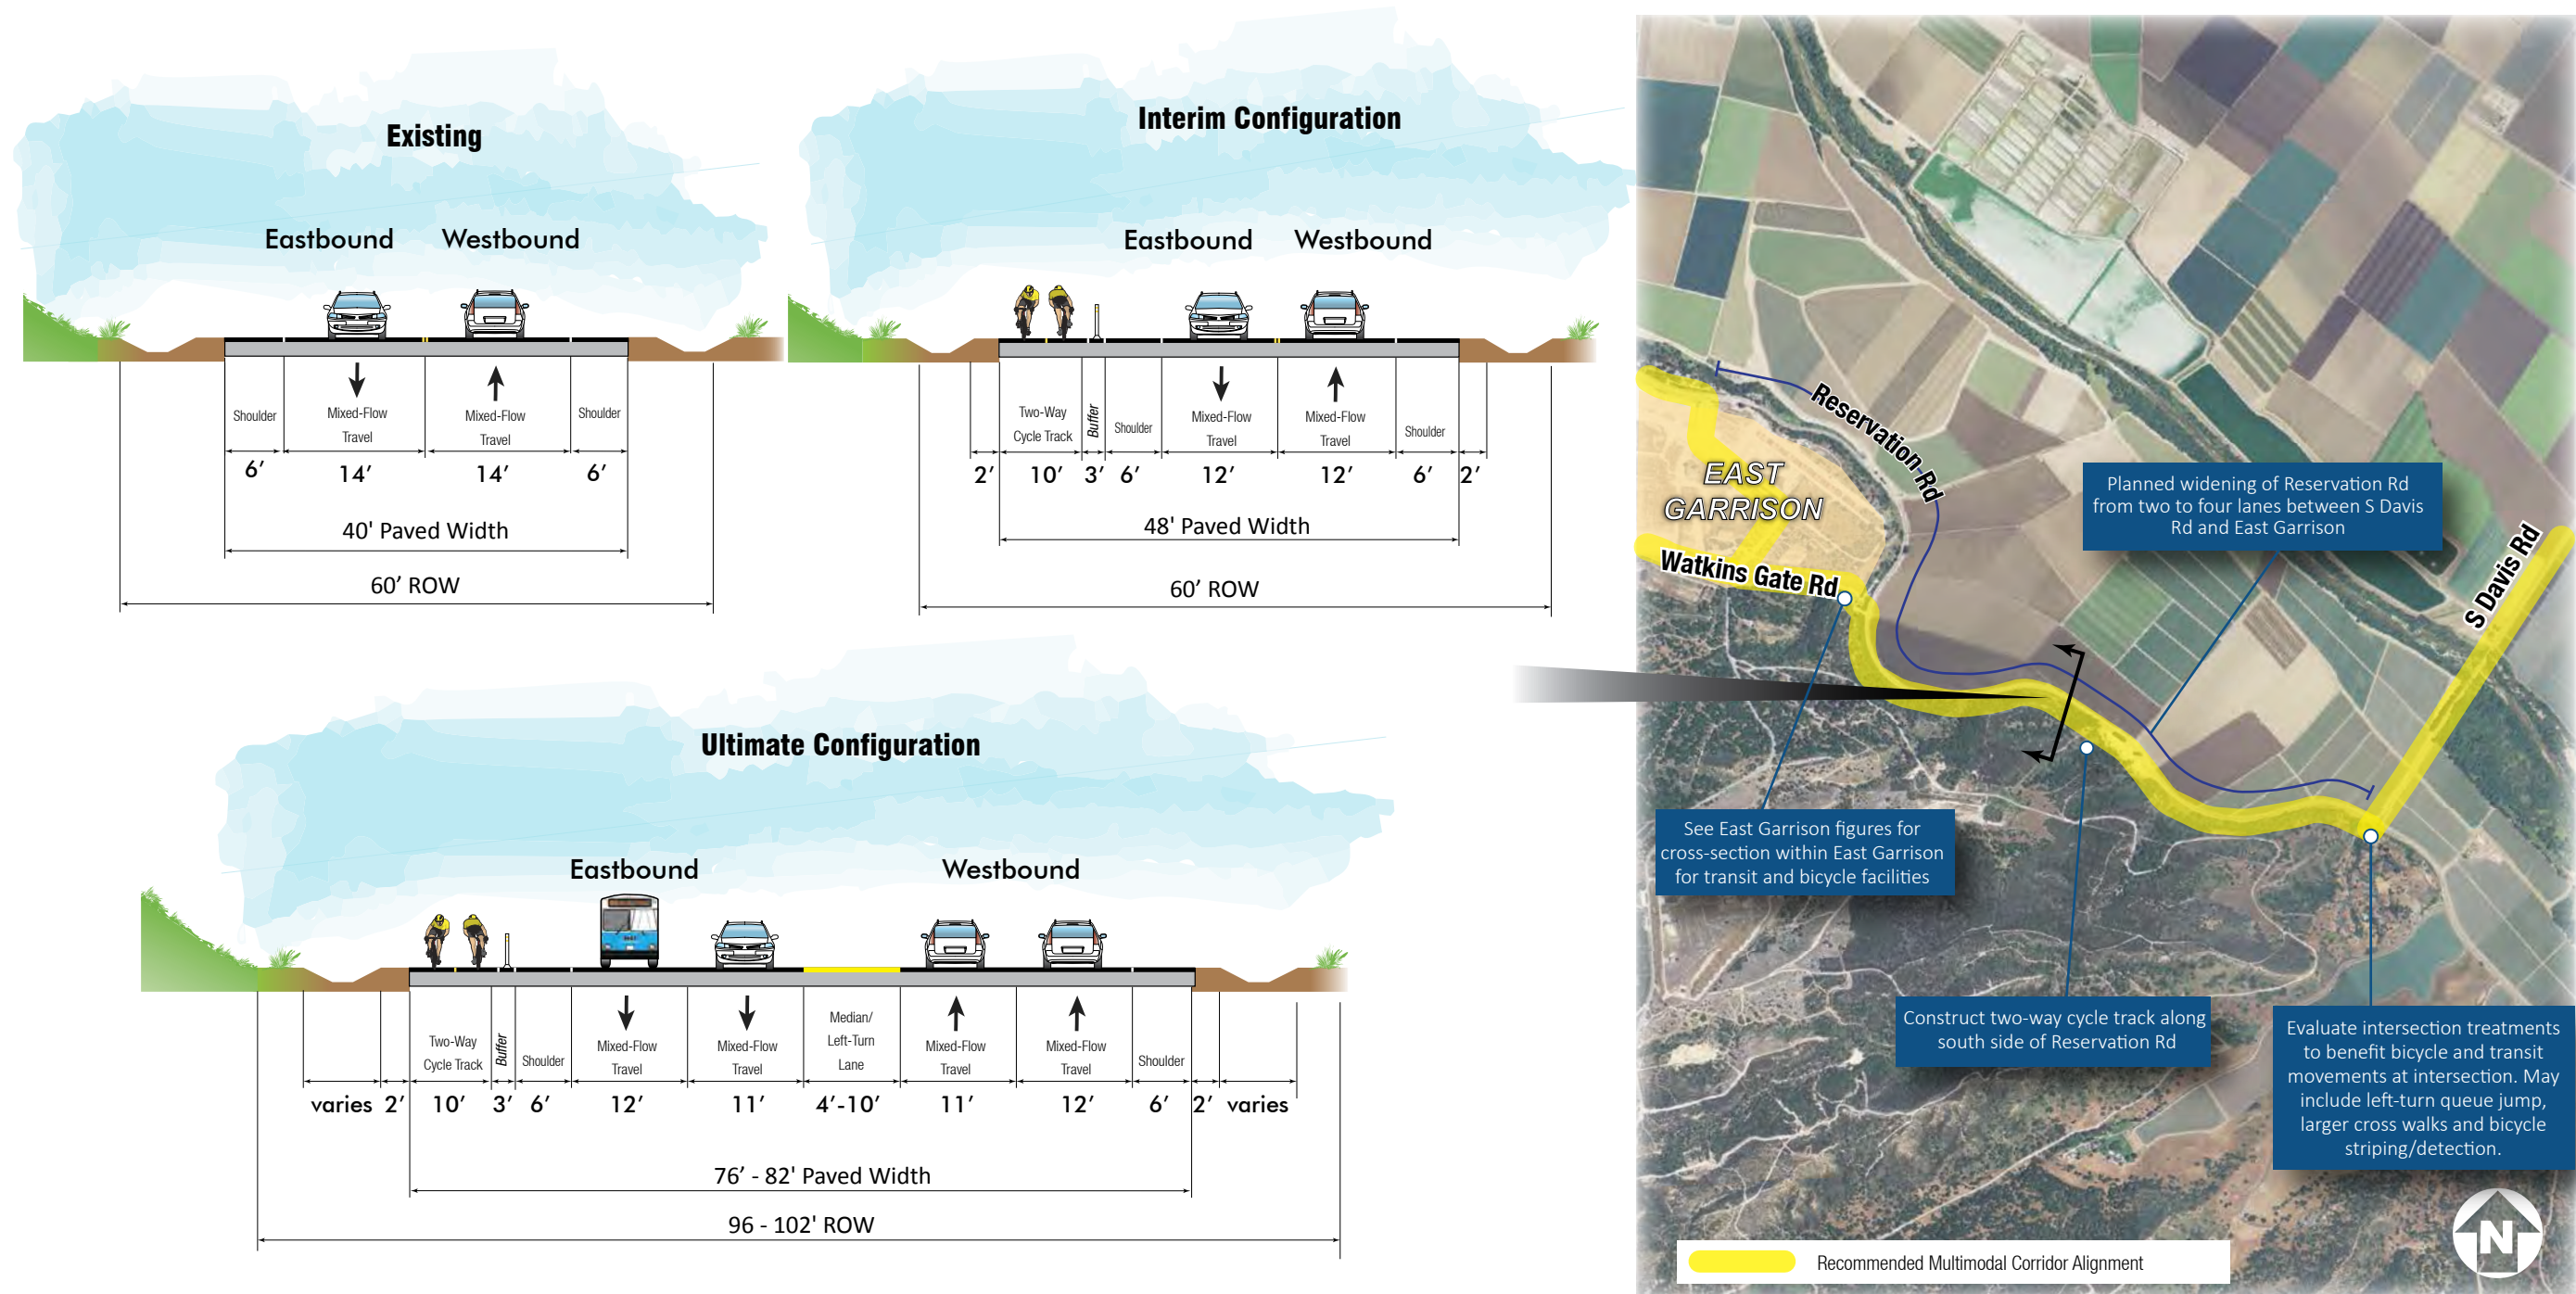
Typical Cross Section: Reservation Road (South Davis Road to Watkins Gate Road)
